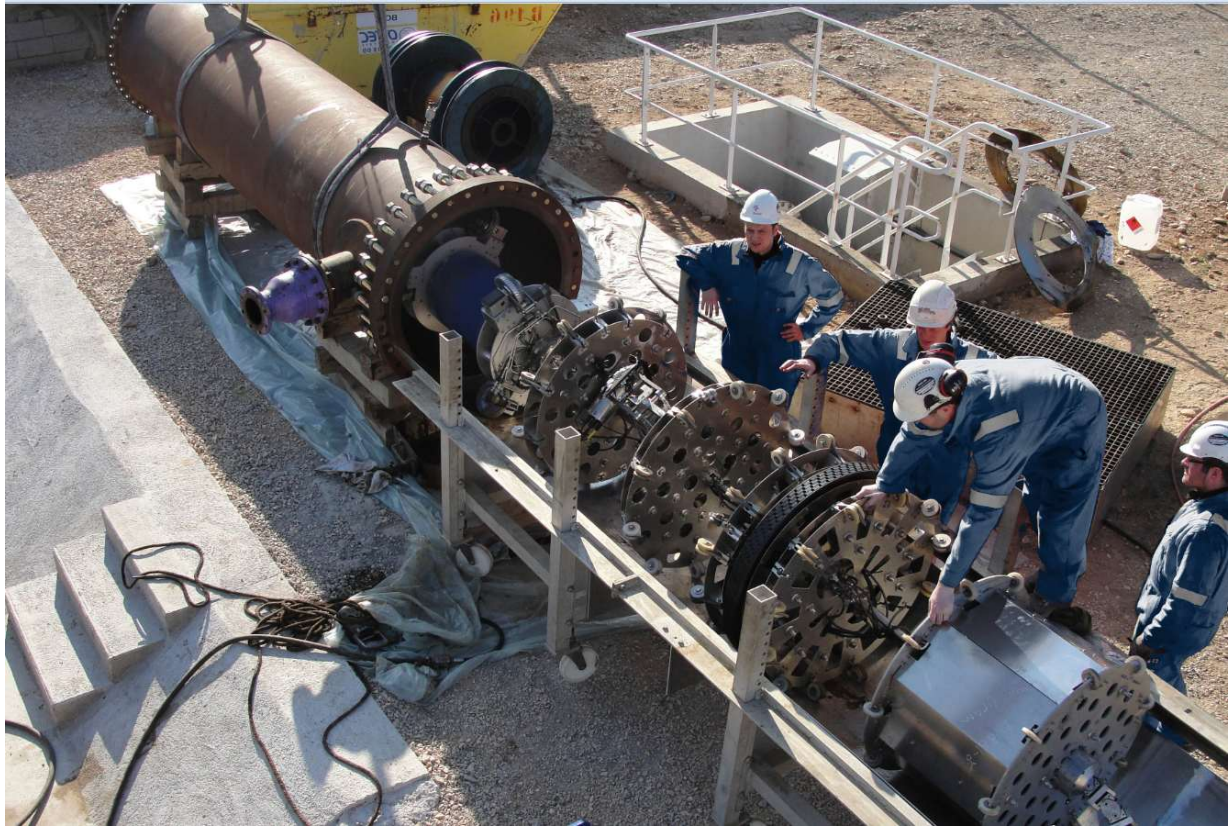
Robotic self-propelled UTWM tool being installed in a spool-piece pipe
